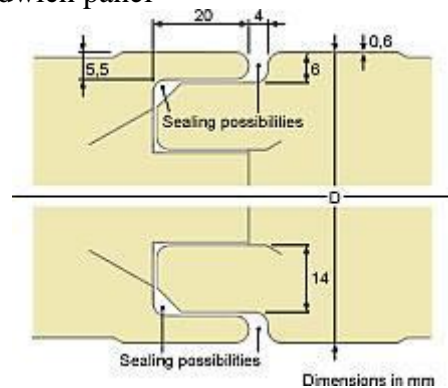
Joining the sandwich panel with sealing possibilities (sandwich construction)
